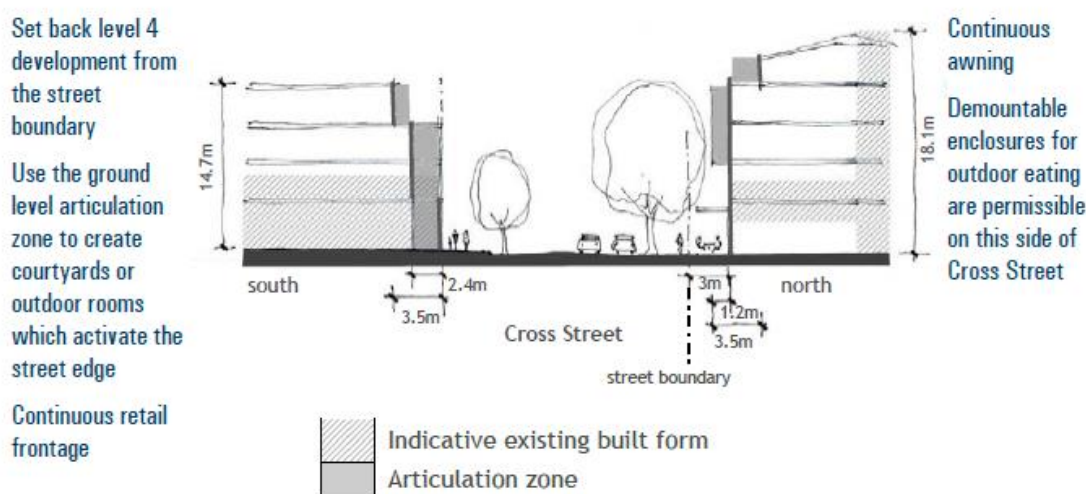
Cross Street Cross Section – D5.4.7 of Woollahra Development Control Plan.
